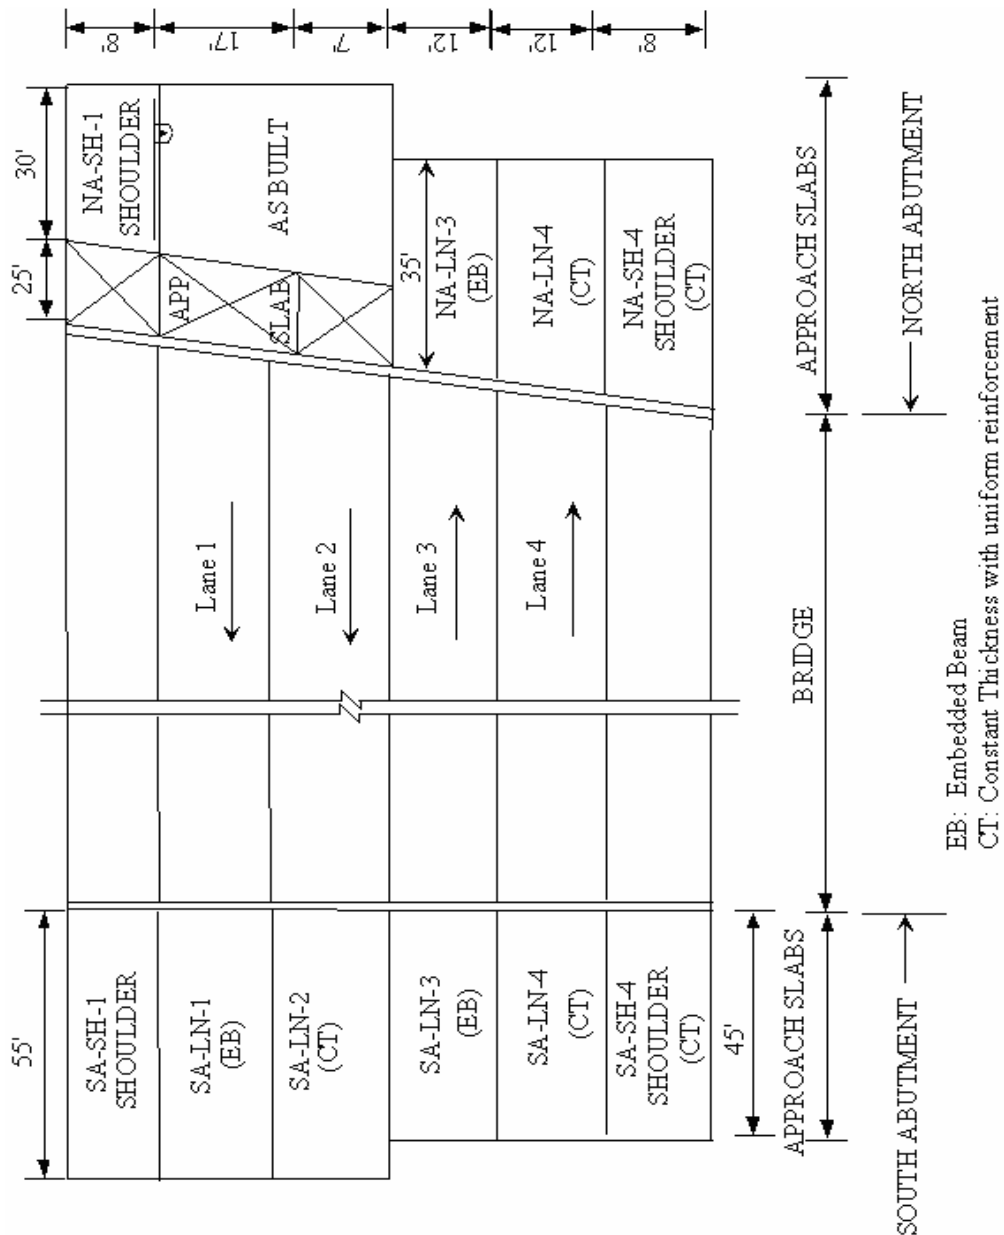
Layout of Approach Slabs on the Doremus Avenue Bridge.
